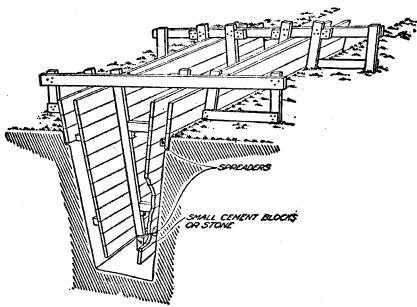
Section of trench for concrete vat with sloping sides, showing the forms in place and one method of bracing. (Compare with fig. 15.)
